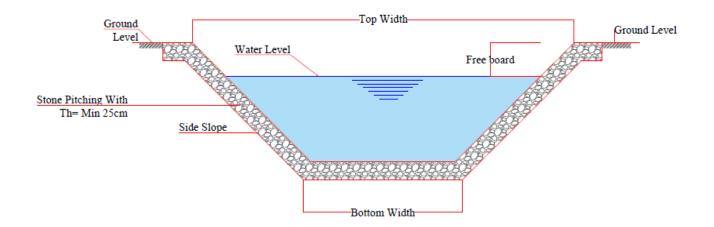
Typical Cross-Section for a Grouted stone-pitching Lined Channel (Bed and Sides)
